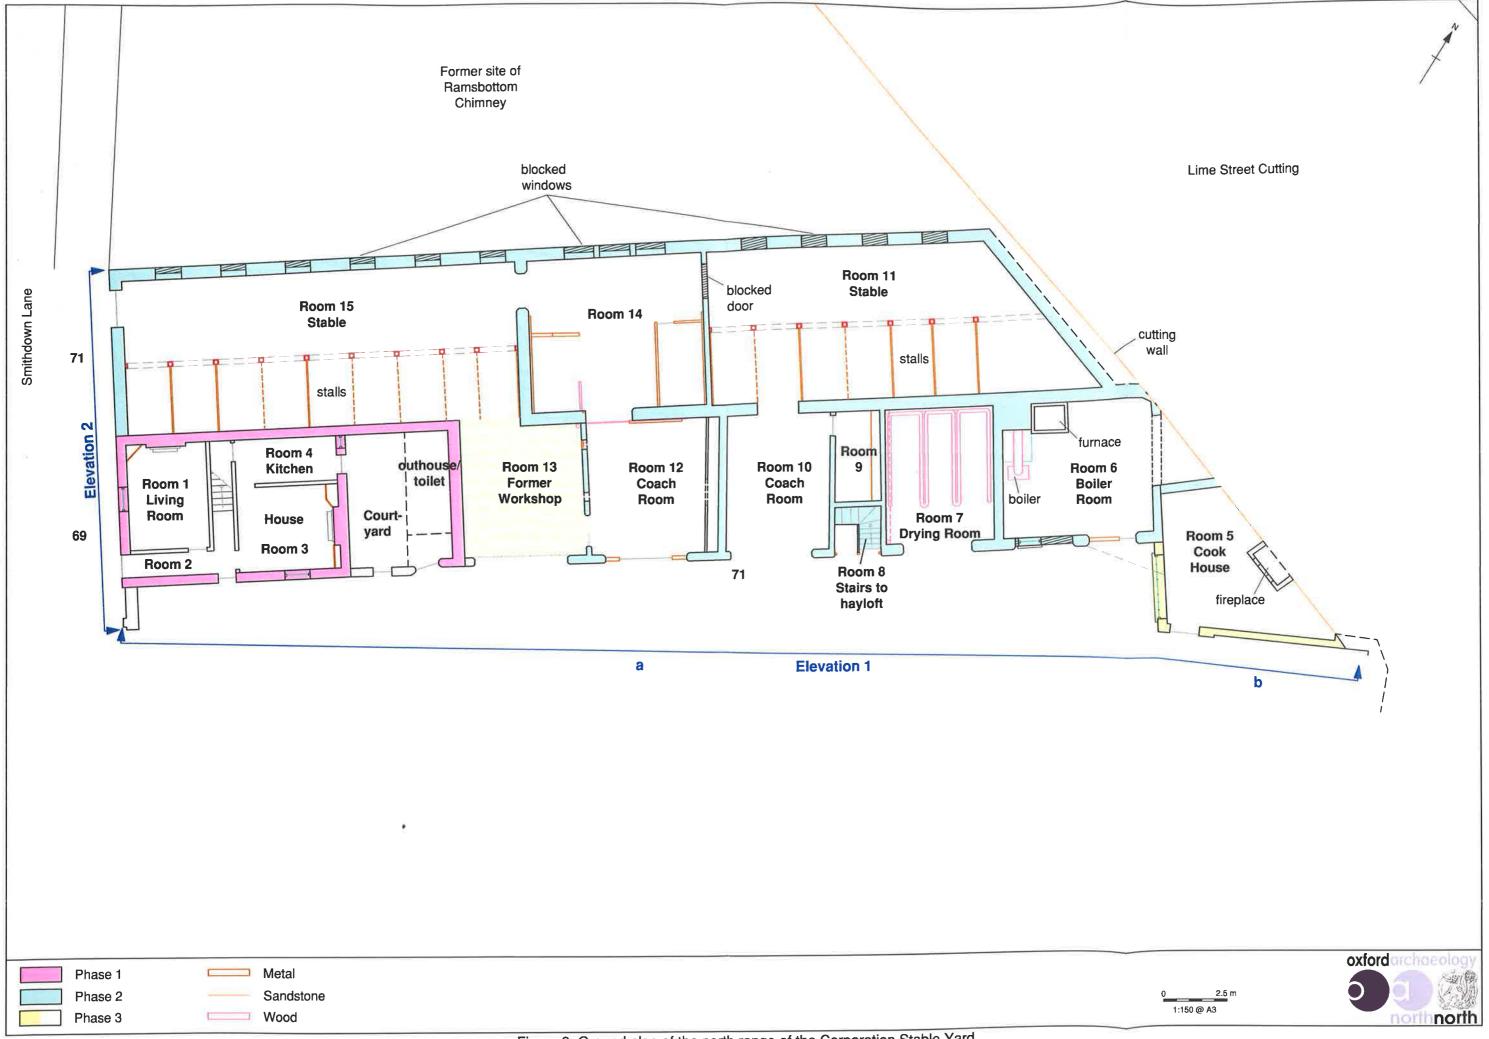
Ground plan of the north range of the Corporation Stable Yard
